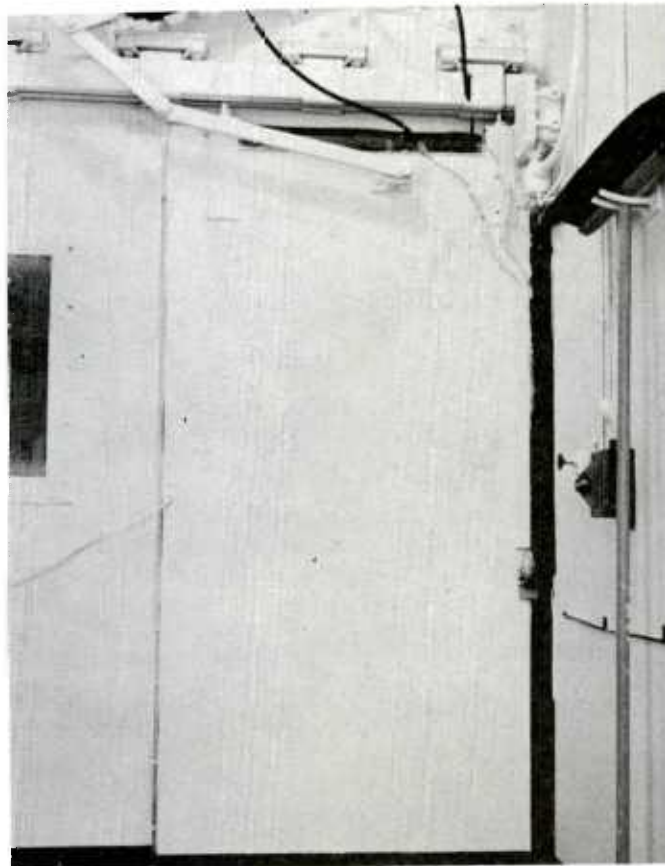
Sliding steel door on bay frontwall, Crane AAP
